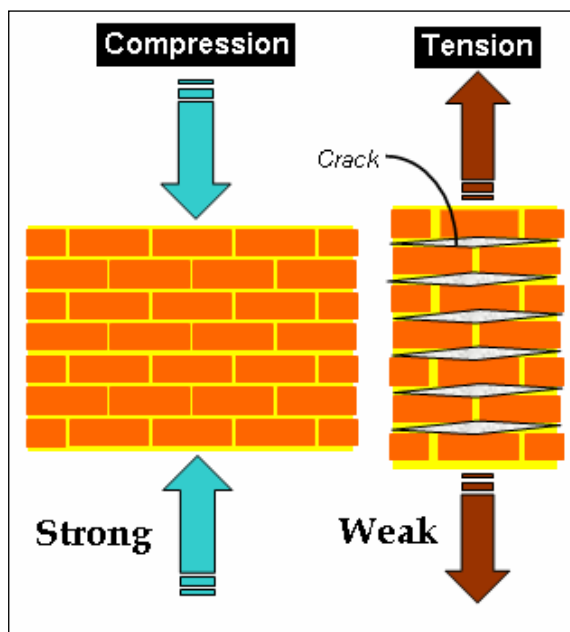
Strength of Load Bearing Masonry Walls in Different Loading Conditions
